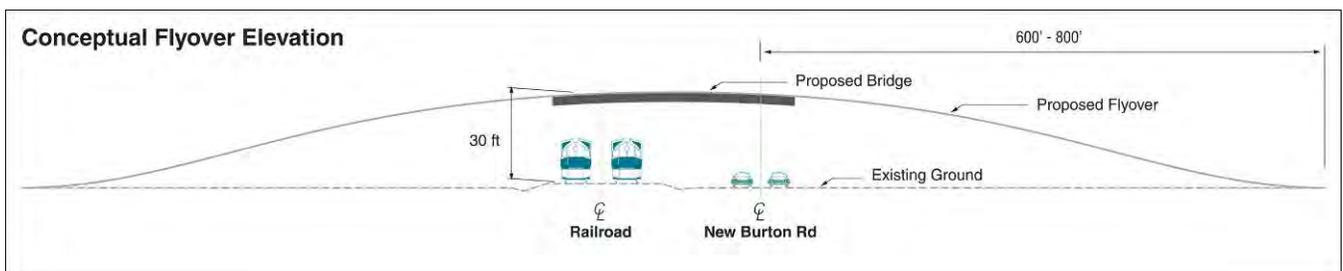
Conceptual Flyover Elevation (40 mph design speed)
